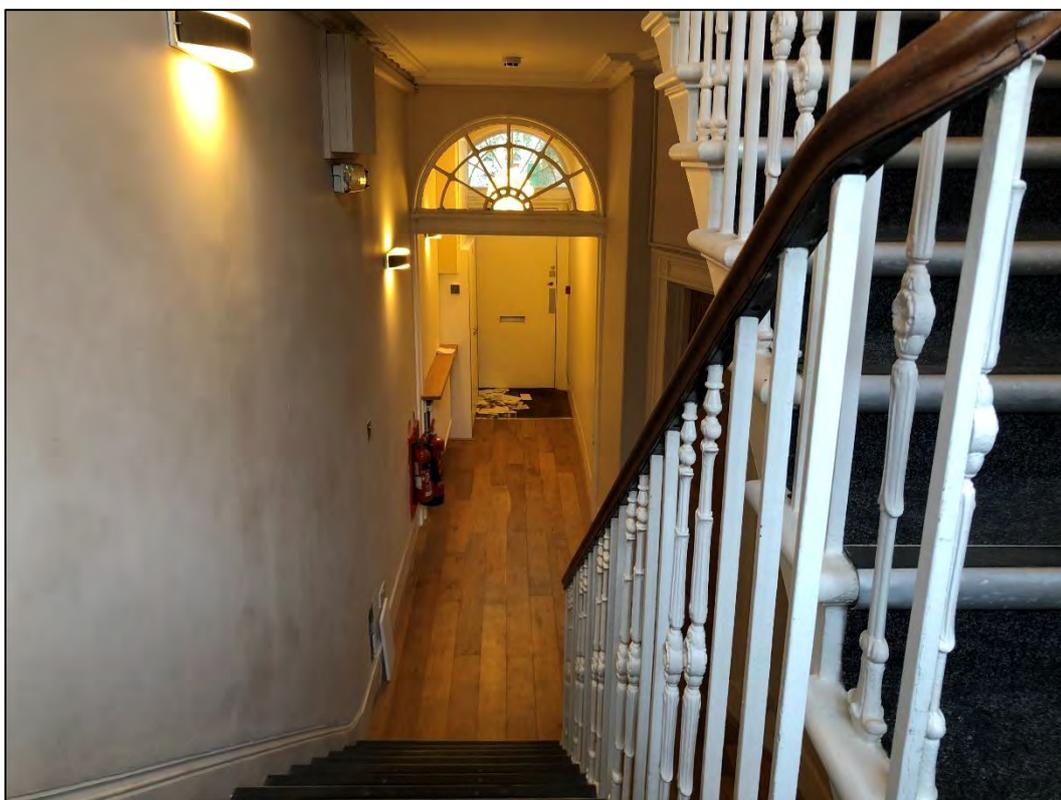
View showing detail of staircase to first floor with mahogany handrail and wrought-iron balusters
